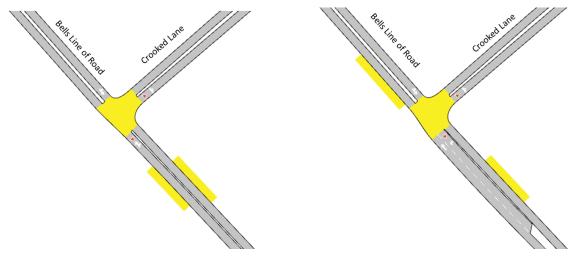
Bells Line of Road and Crooked Lane intersection (Location 6) – existing layout (left) and proposed upgrade (right)
